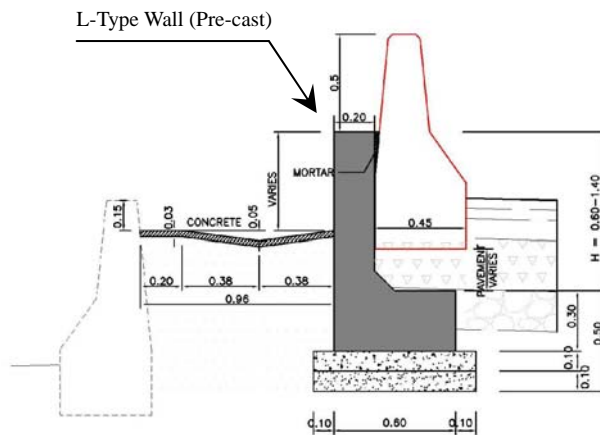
Concrete Barrier with L-Type Wall
